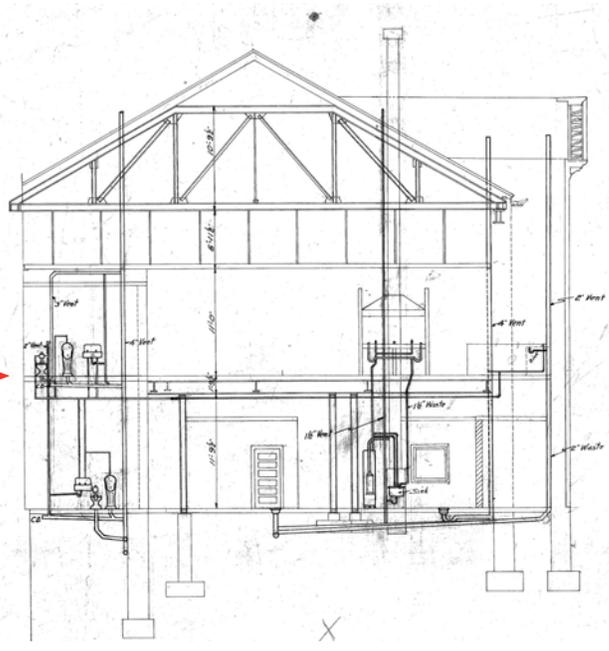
Section drawing through the Boiler House from 1939 construction drawings, looking west, showing insertion of the new floor after the boilers were removed (City of Pittsburgh, Department of Public Works).
